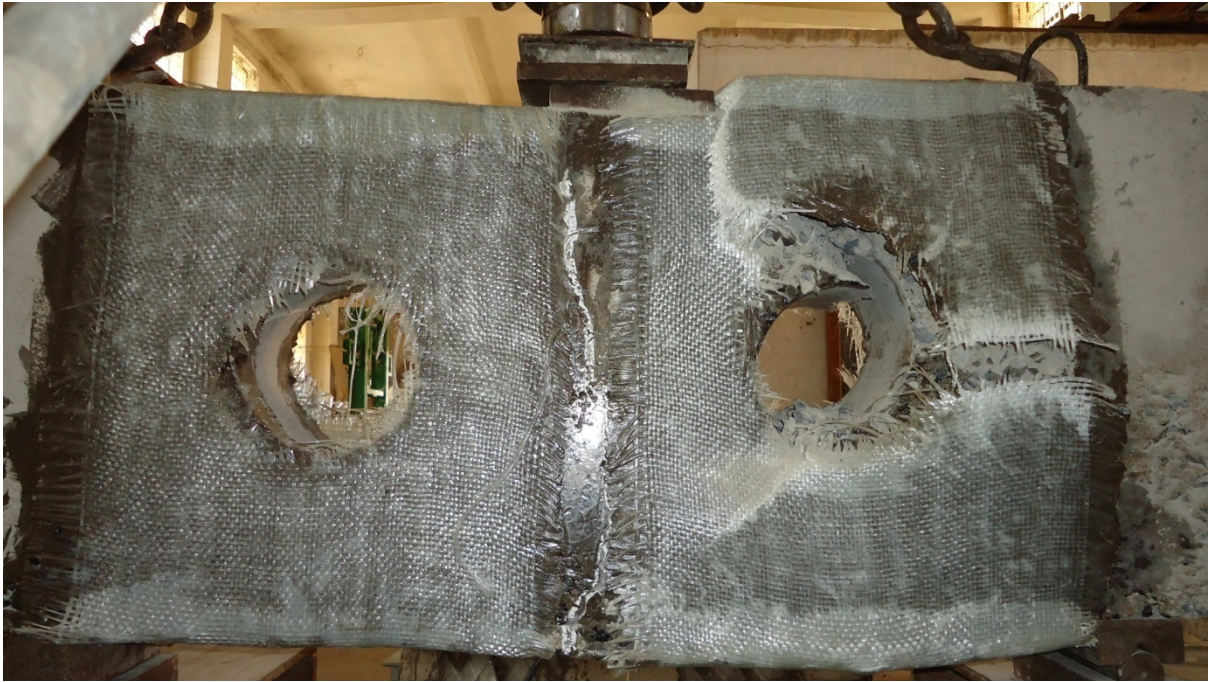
Beam 4 showing flexural crack and rupture of GFRP
